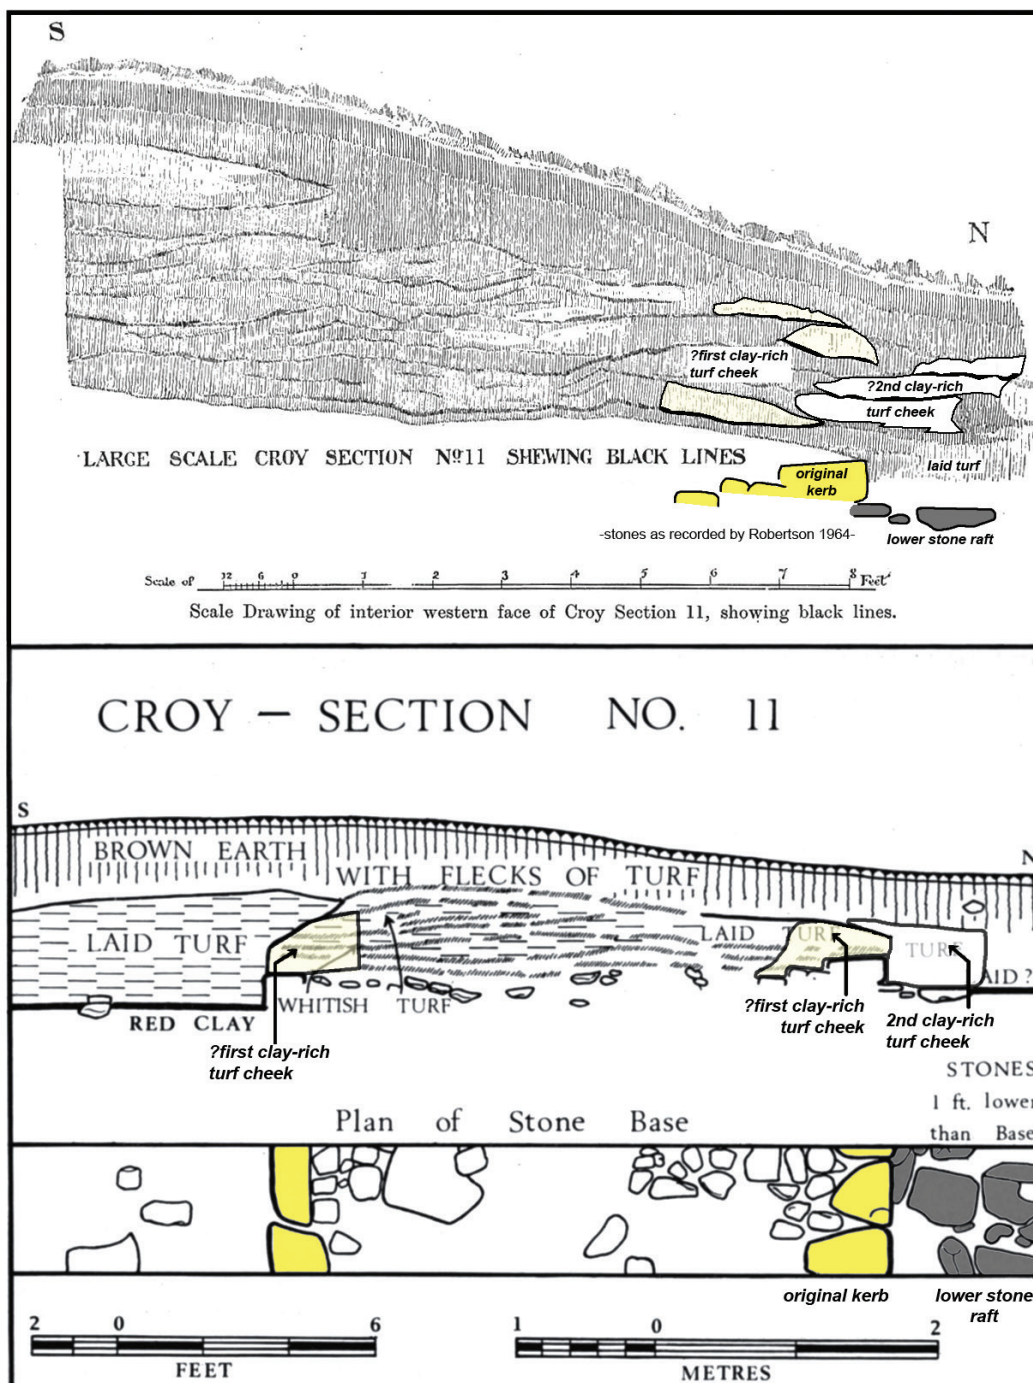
Sections and plan through Antonine Wall at Croy No. 11, central part, sector 5/6. 1890's section by GAS above, section and plan by A. Robertson 1967 below. Whitish clay blocks of northern and southern faces emphasized. Two narrow turf cheeks in north face interpreted as original cheek (yellow) coinciding with original kerb position, later cheek (white) built on top of added lower stone raft against slumping of earlier cheeks. Reopening of 1890s section by Robertson in 1967 showed laid turf in front of northern stone kerb, placed on stone raft c. 0.3 m foot than original base (drawn by T. Romankiewicz after GAS 1899: 73 and Robertson 1969: Fig 1).
